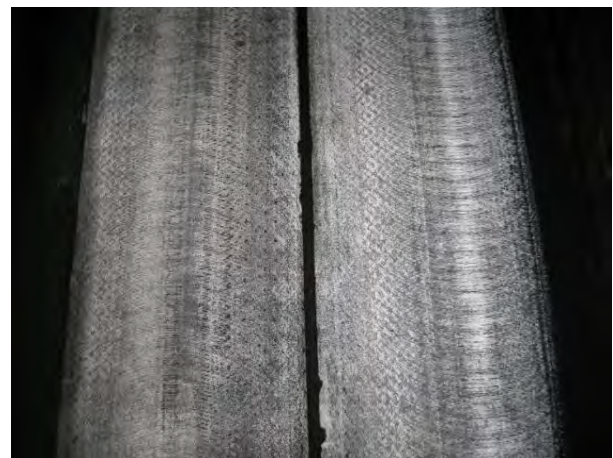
HEAVY RUBBER DEPOSITS WERE REMOVED FROM THIS CENTERLINE MARKING WITH ULTRA HIGH-PRESSURE WATERBLASTING.
